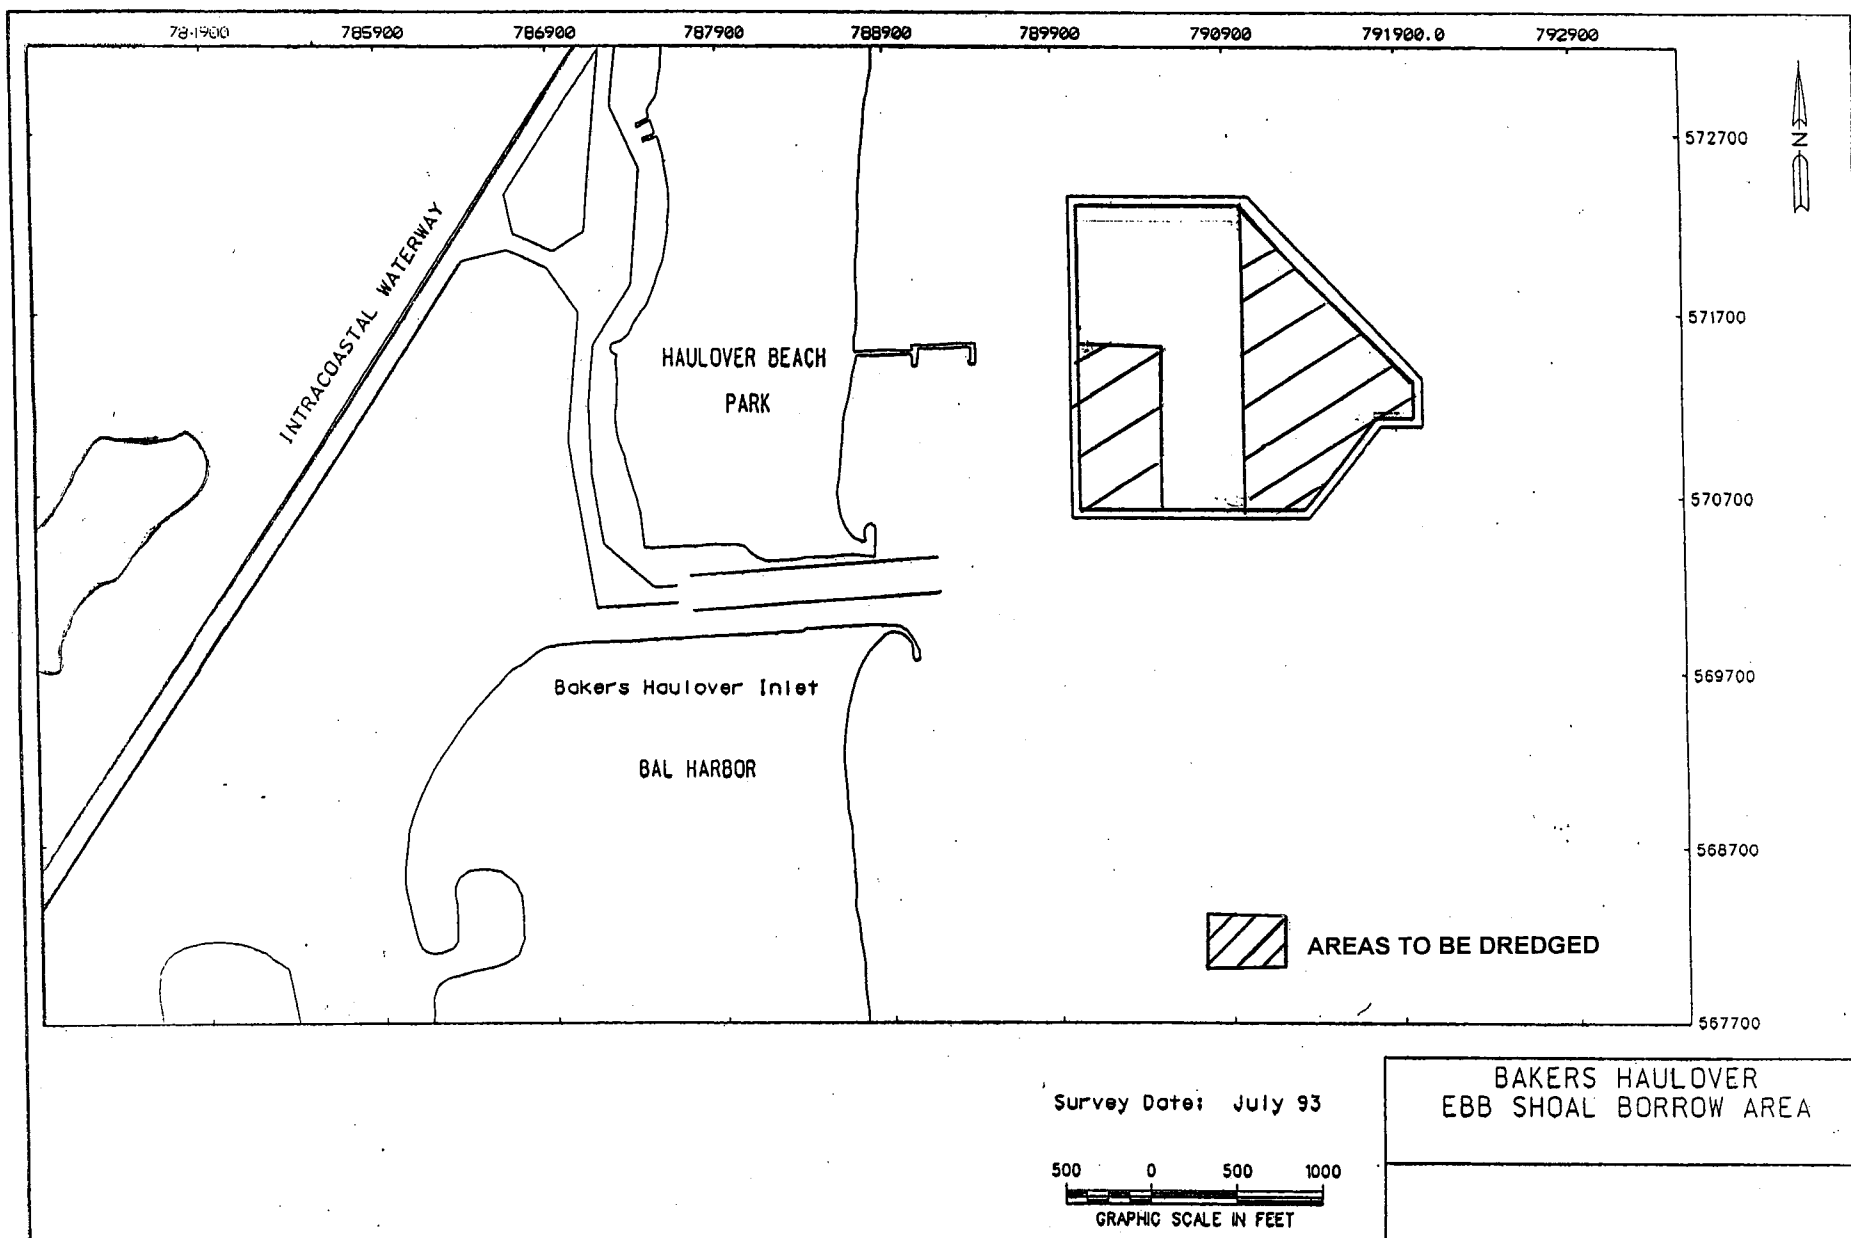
Potential borrow area at Baker's Haulover ebb shoal.
